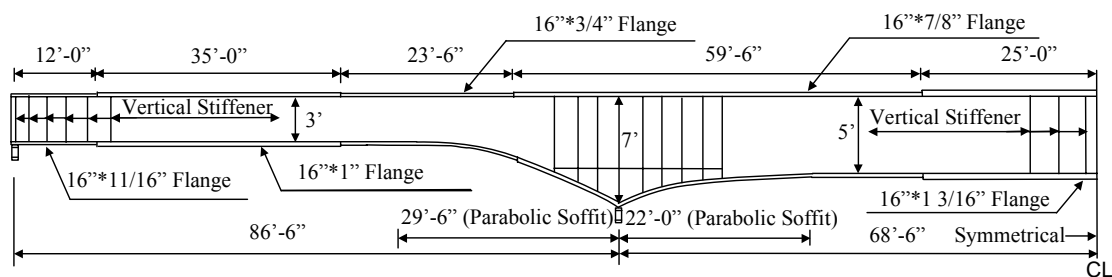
Typical Profile of Longitudinal Plate Girder
